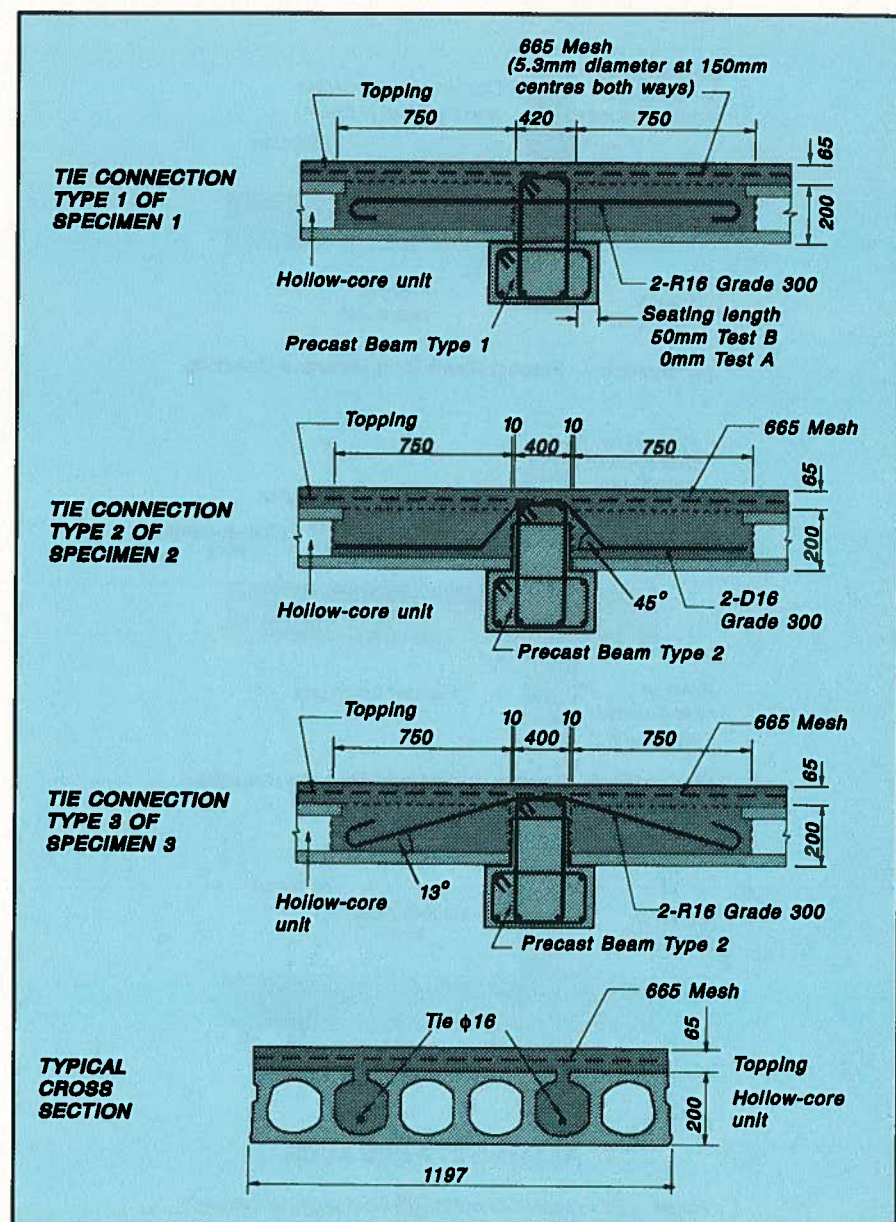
Types of special support reinforcement at the ends of hollow-core floor units tested at the University of Canterbury (Ref. 13).
